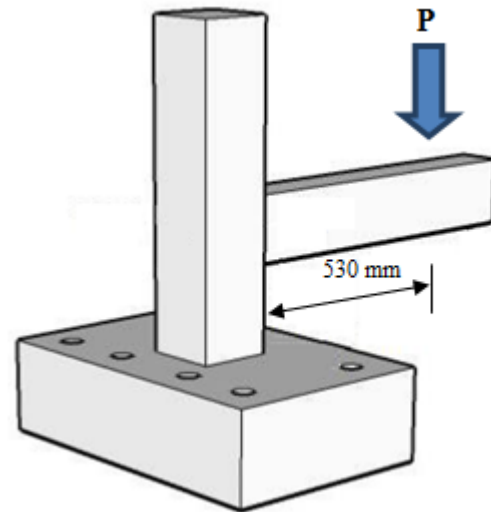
Schematic drawing of RC beam-column joint sub-assemblages
